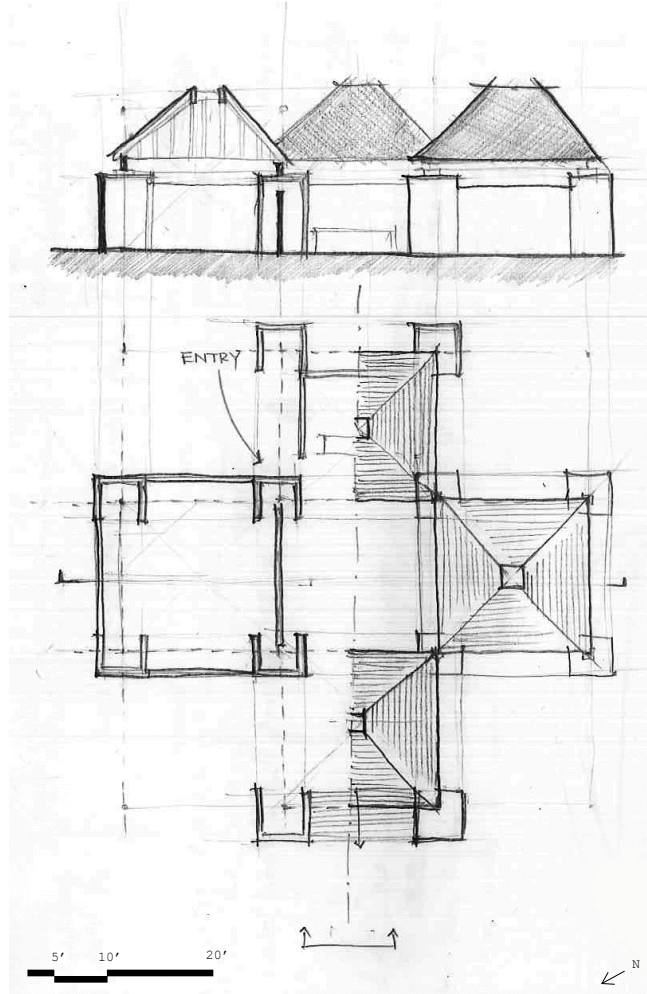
Louis I. Kahn. Plan and roof plan of the Trenton Bath House. Trenton Bath House, Ewing Township, NJ, 1954-59.
